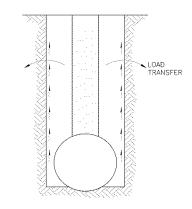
Trench Installation (friction on trench sides reduces the width of the column of fill carried by the pipe)
